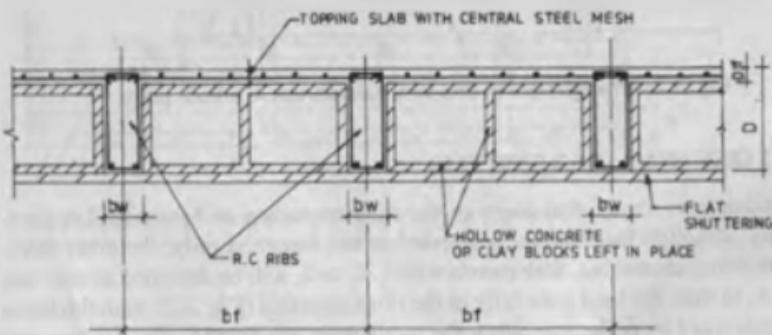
Ribbed slab with precast blocks left in place (this looks flat from below).
